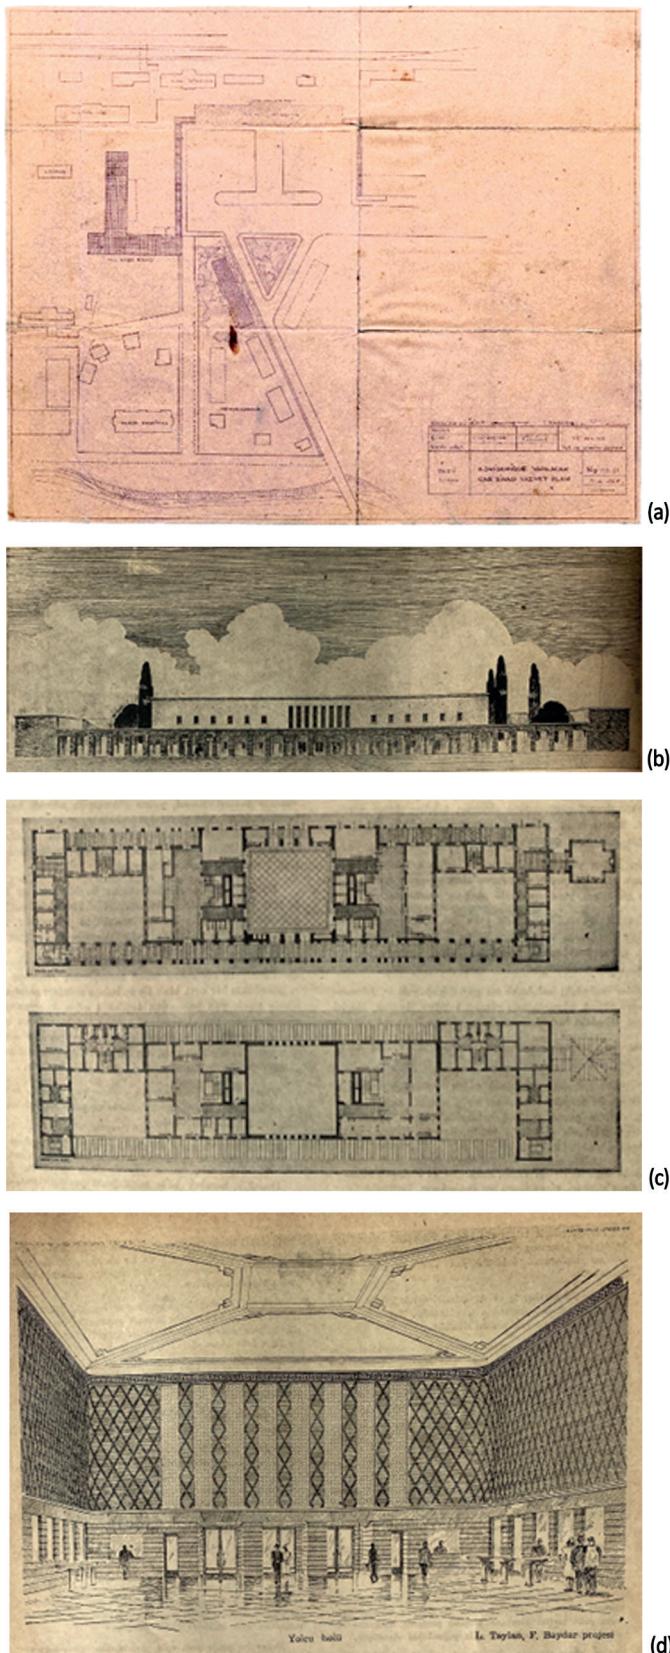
(a) Eskişehir Railway Station, Site Plan, 1/1000, (F. Gürkaynak, 9.4.1946; Competition brief document; Salt research archive) (b) Front elevation of the passenger hall of the first award project (c) Floor plans of the passenger hall of the first award project; (d) Perspective of the passenger hall of the first award project (Hotan, 1947, p.18).
